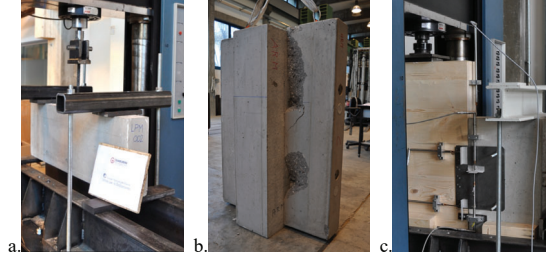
Prefabricated beam foundation element: a) tensile test; b) specimen after the shear test; c) wall panel-to-beam connection test.
